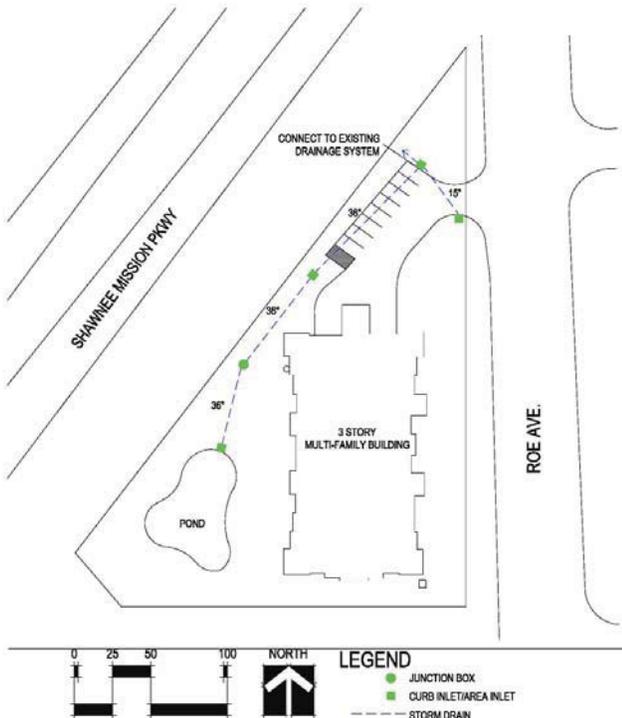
Roe Avenue Multi-Family Development: Traditional Site Layout
